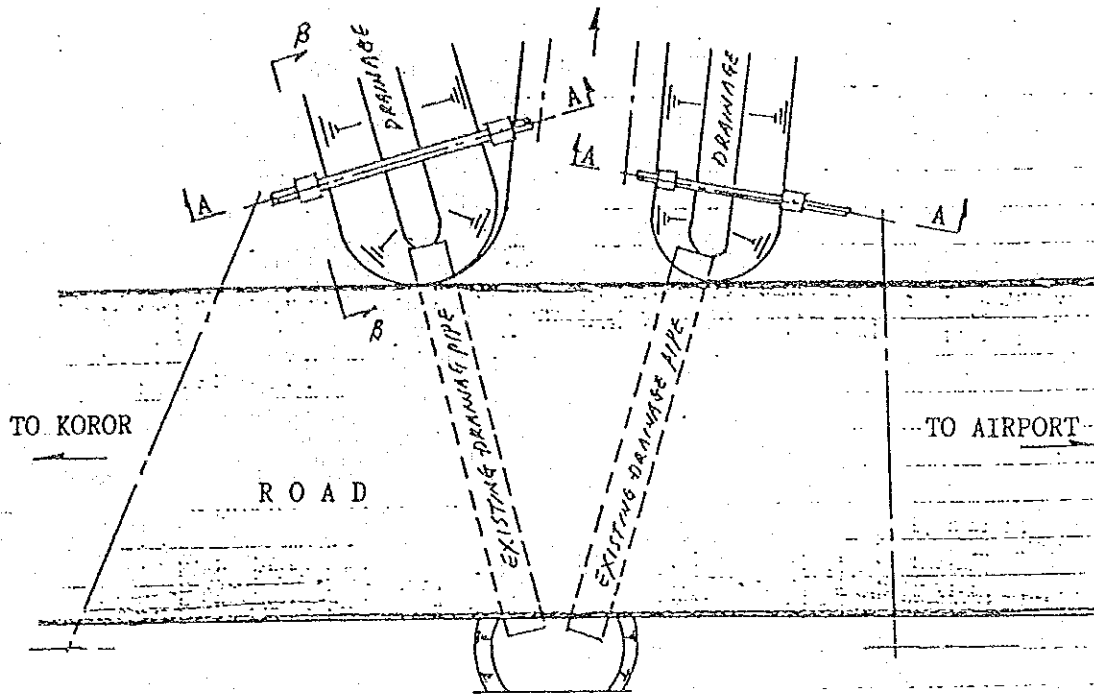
DETAIL OF WATER PIPE LINE BESIDE EXIST. CULVERT
